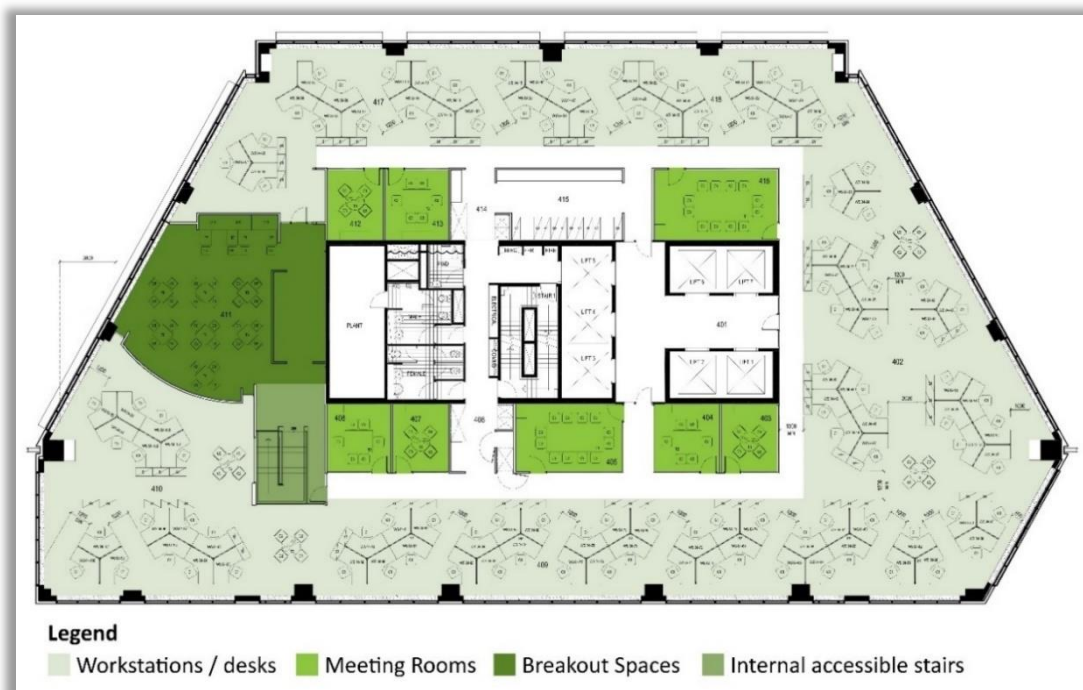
Typical floorplan of floors occupied by the organisation (Site B)
